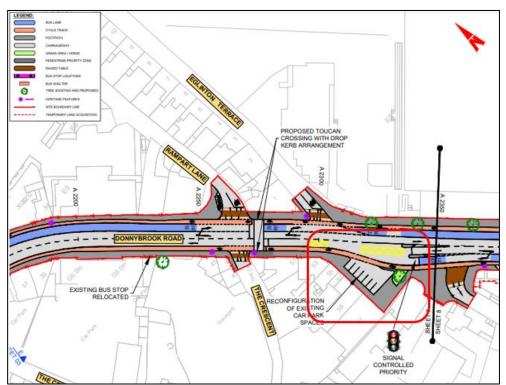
Extract from General Arrangement Drawings at No.55 to 61 Donnybrook Road (Sheet 07)
